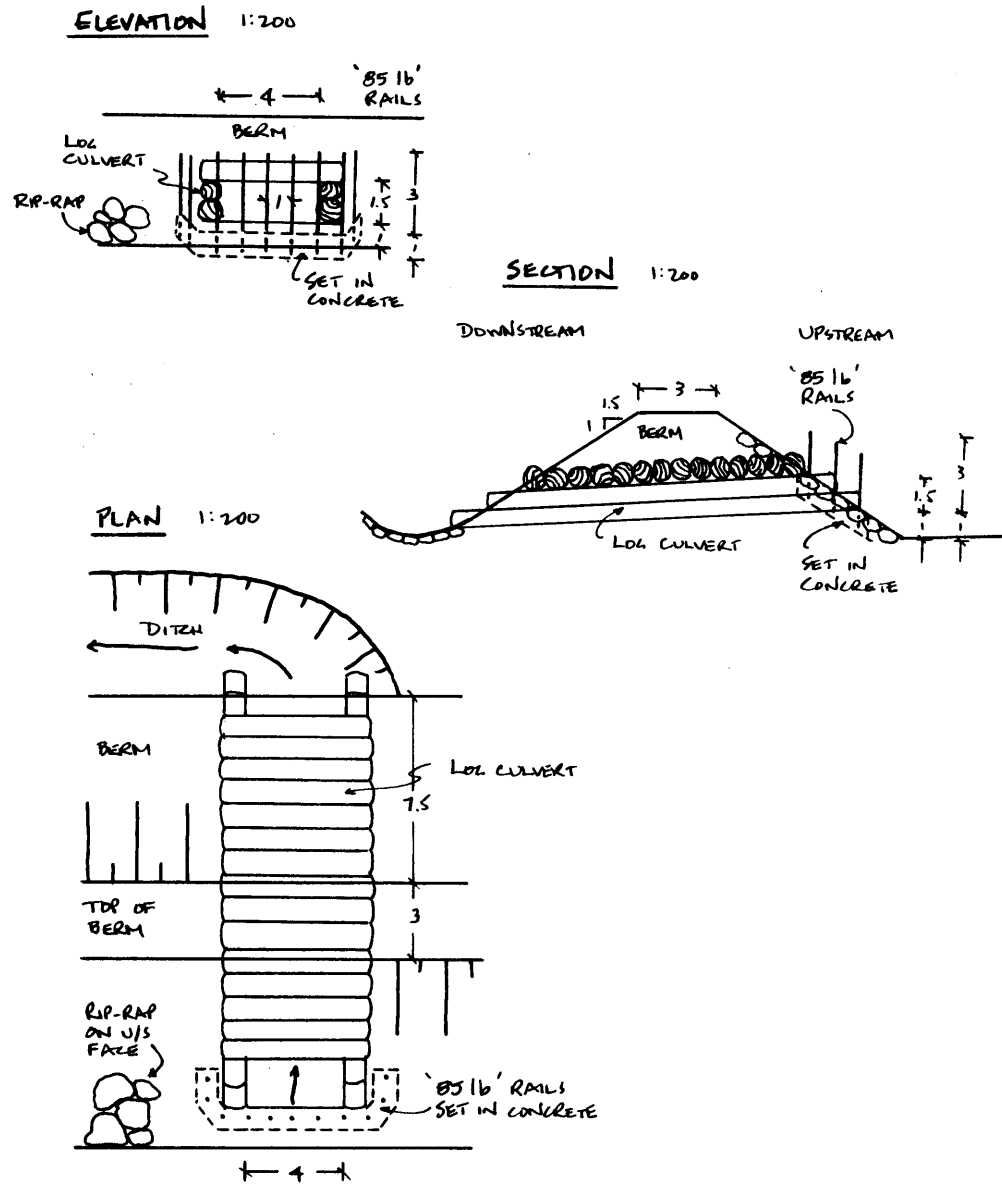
Details of secondary culvert (only log culvert shown).
